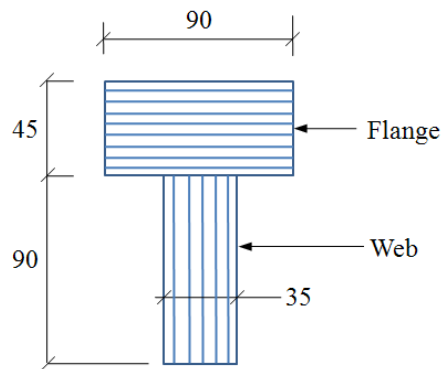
Cross-section and dimensions of the numerical timber beam models (mm).
